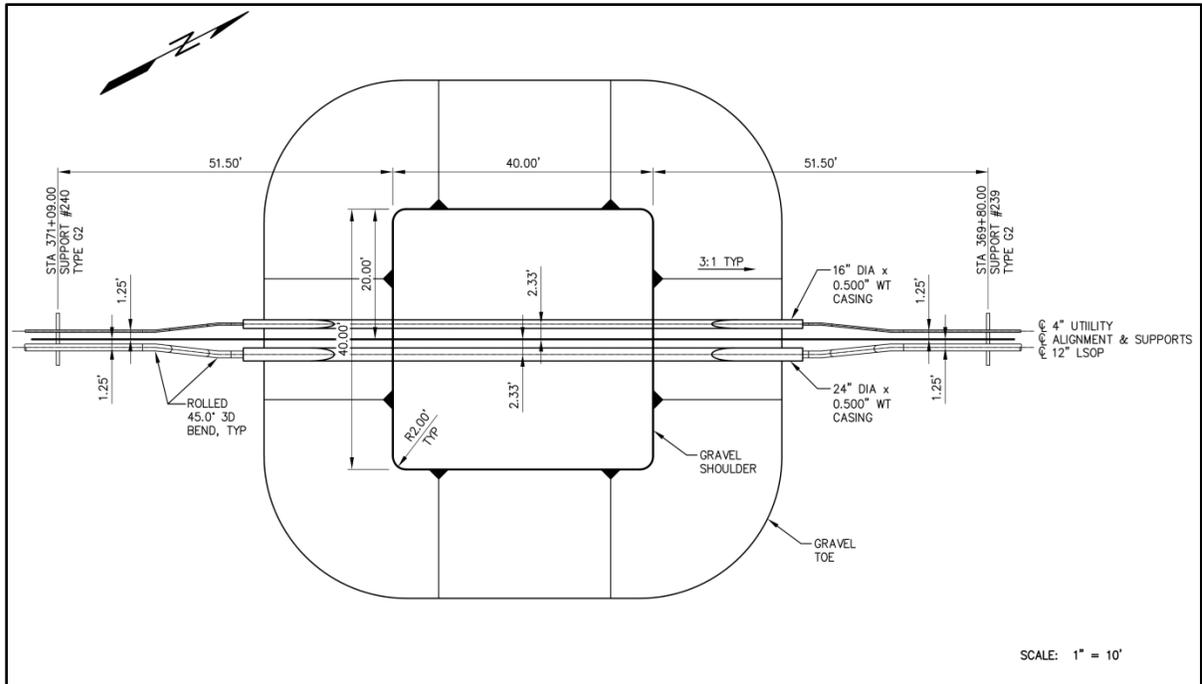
Badami Ice Road Crossing Pad, Plan View
